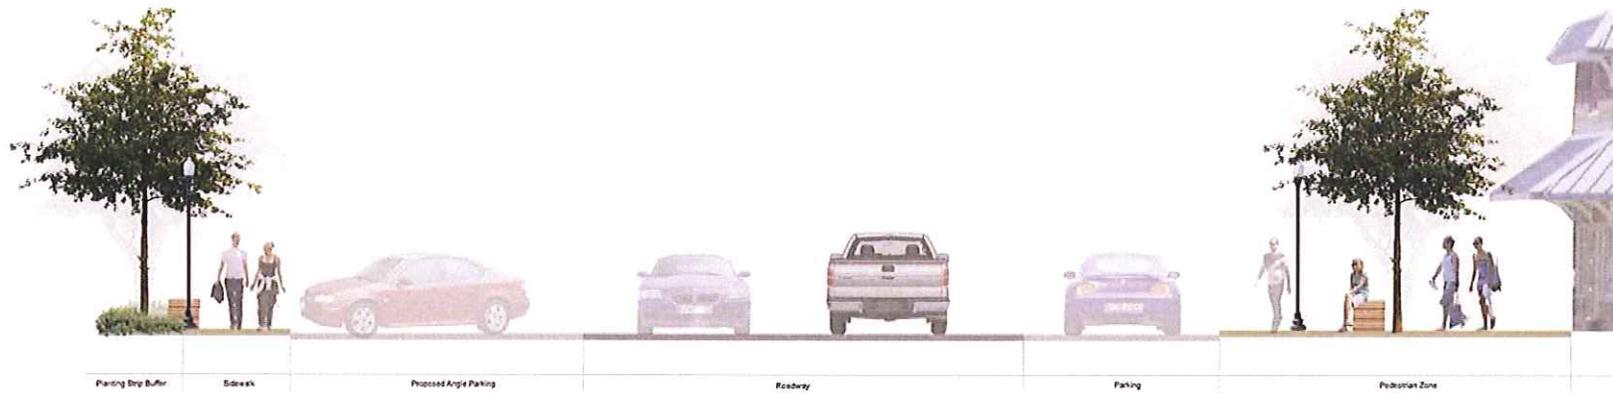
Schematic Cross Section—Front Street (Village Centre)
